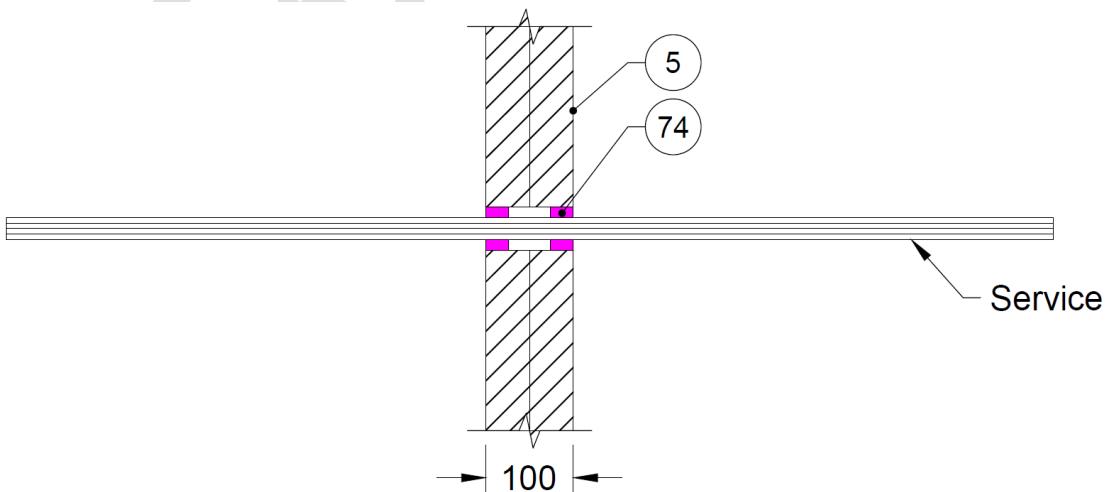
Section View of Pipes Installed in Vertical Substrates
